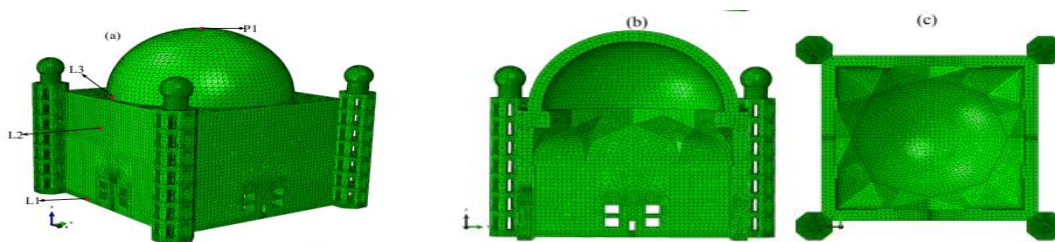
GolGumbaz finite element model: (a) 3.D Perspective (b)Vertical Cross-Section (c)Reflected ceiling layout
